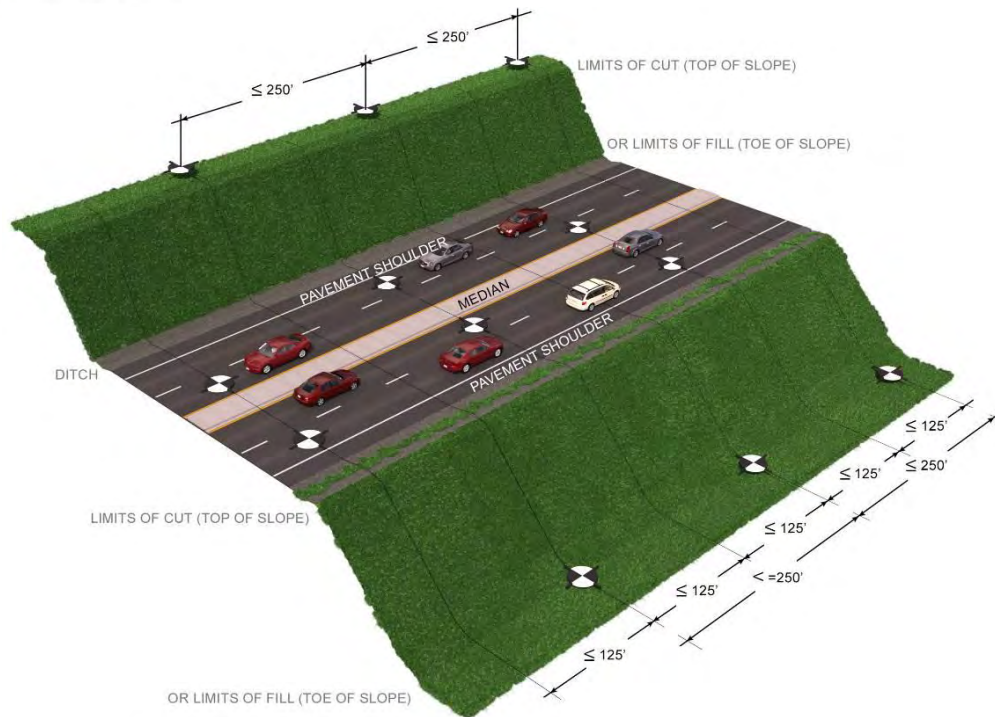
| Example of Soil Test Boring Layout for a Four-Lane Road Constructed over Embankment and/or Cut Slope Higher Than 25 Feet
